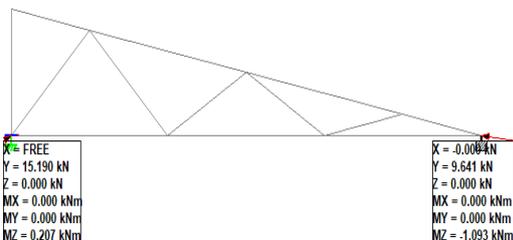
END FORCES OF FINK TRUSS SECTION
